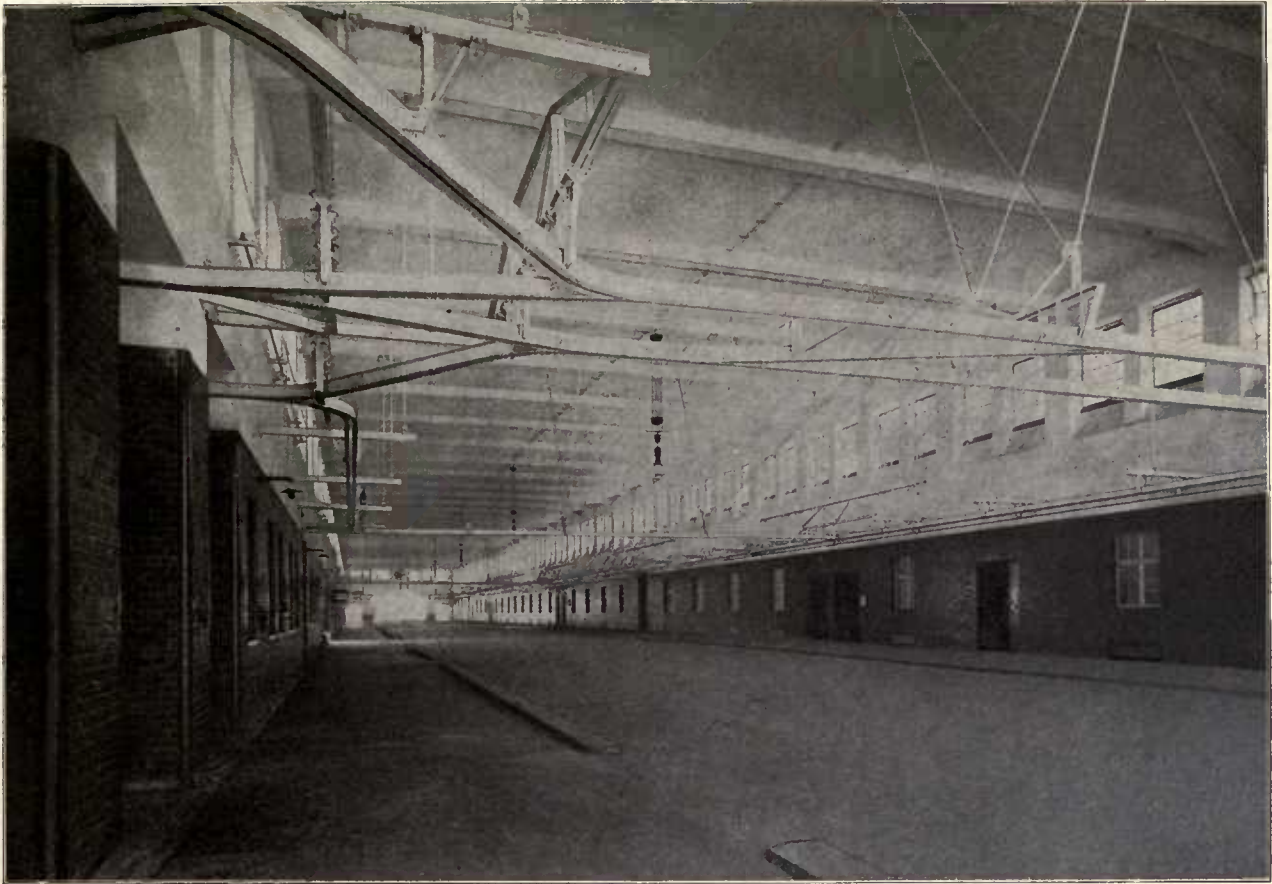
Intermediate Hall connecting Slaughter House and Cooling House
